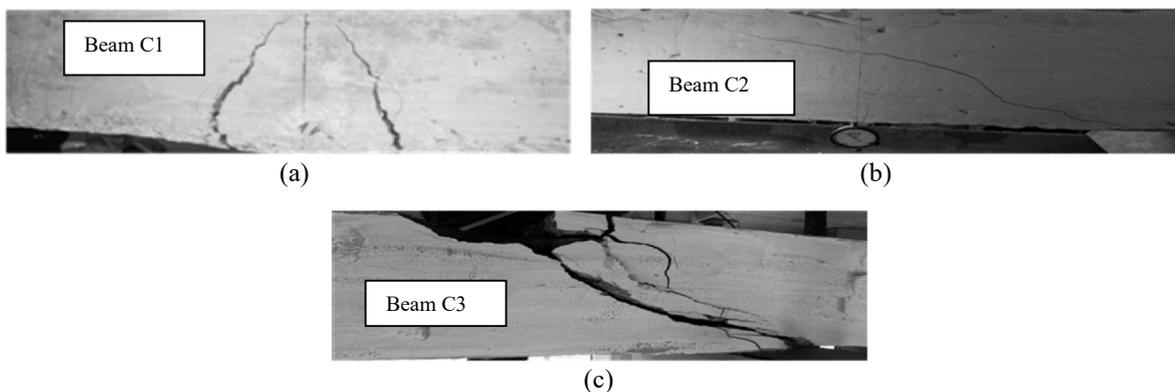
Failure pattern of beams (a) beam C1 (b) beam C2 (c) beam C3
